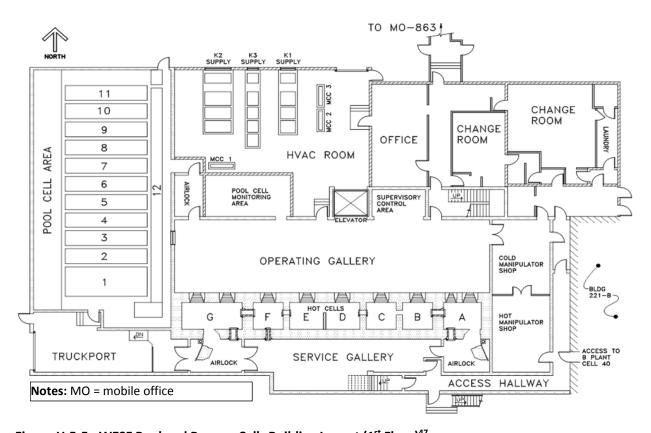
WESF Pool and Process Cells Building Layout (1st Floor)⁴⁷
